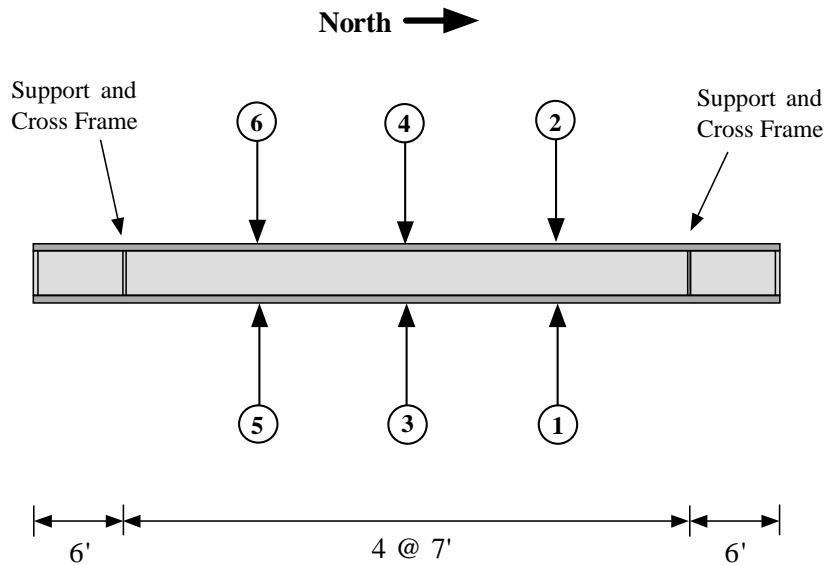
Plan View of Girder Showing Location of Lateral Displacement Gages
